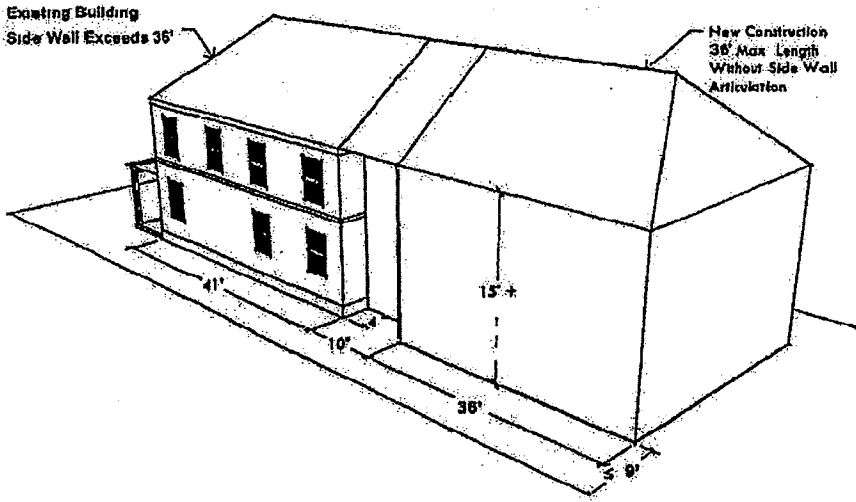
Side Wall Articulation (Existing Side Wall Exceeds 36 Feet)
